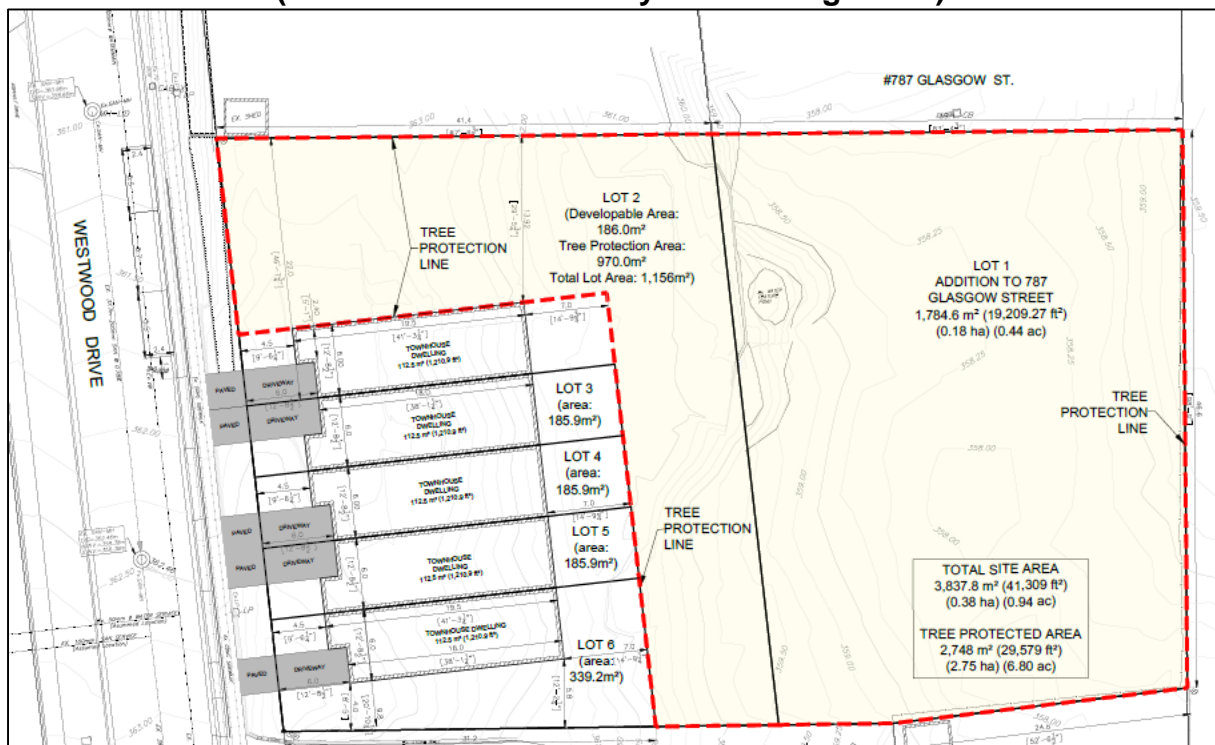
Approved Plan for Five (5) Street Townhouse Dwellings and Tree Protection Area
